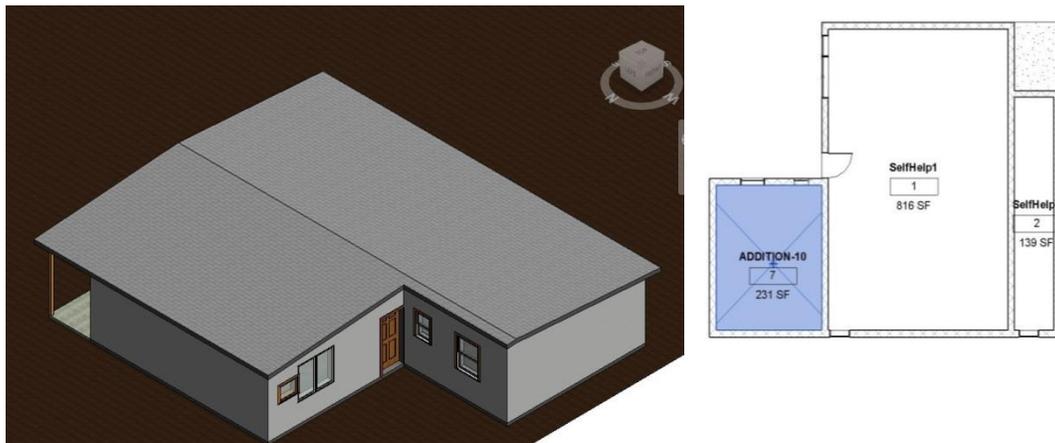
House 30 with West-B option addition: 3-dimensional image and plan
